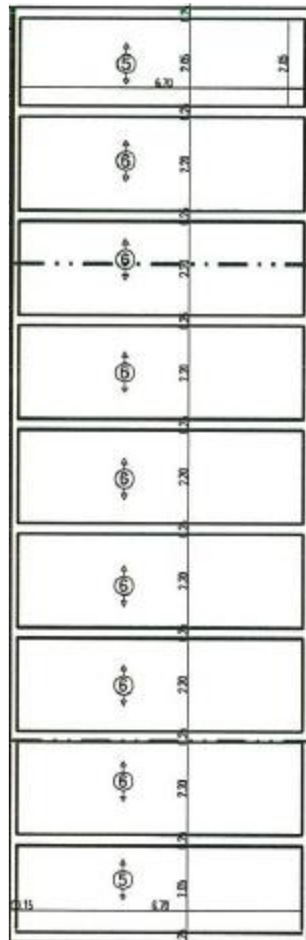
Plane of simple beam slab with characteristic dimensions
